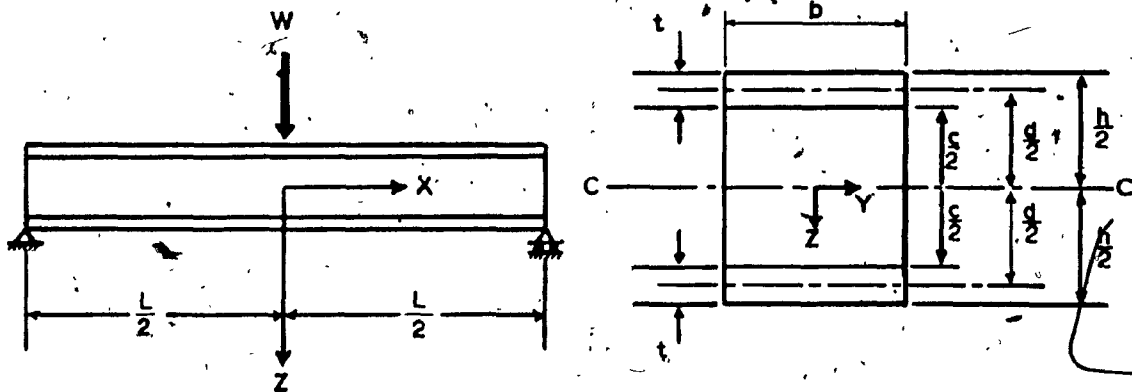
SIMPLY SUPPORTED CENTRALLY LOADED SANDWICH BEAM (LEFT) WITH TYPICAL CROSS-SECTION (RIGHT)
